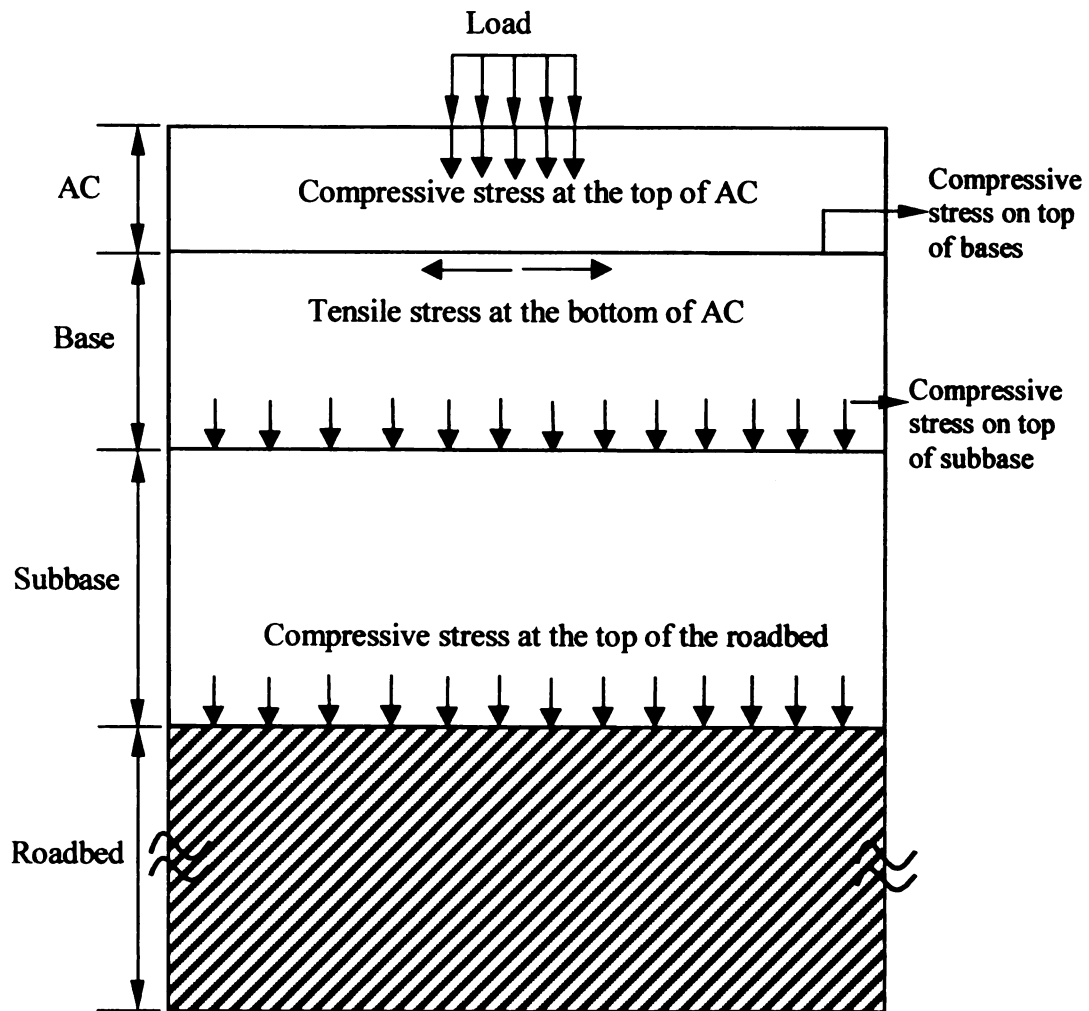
Illustration of critical stress/strain locations in a typical pavement structure.
